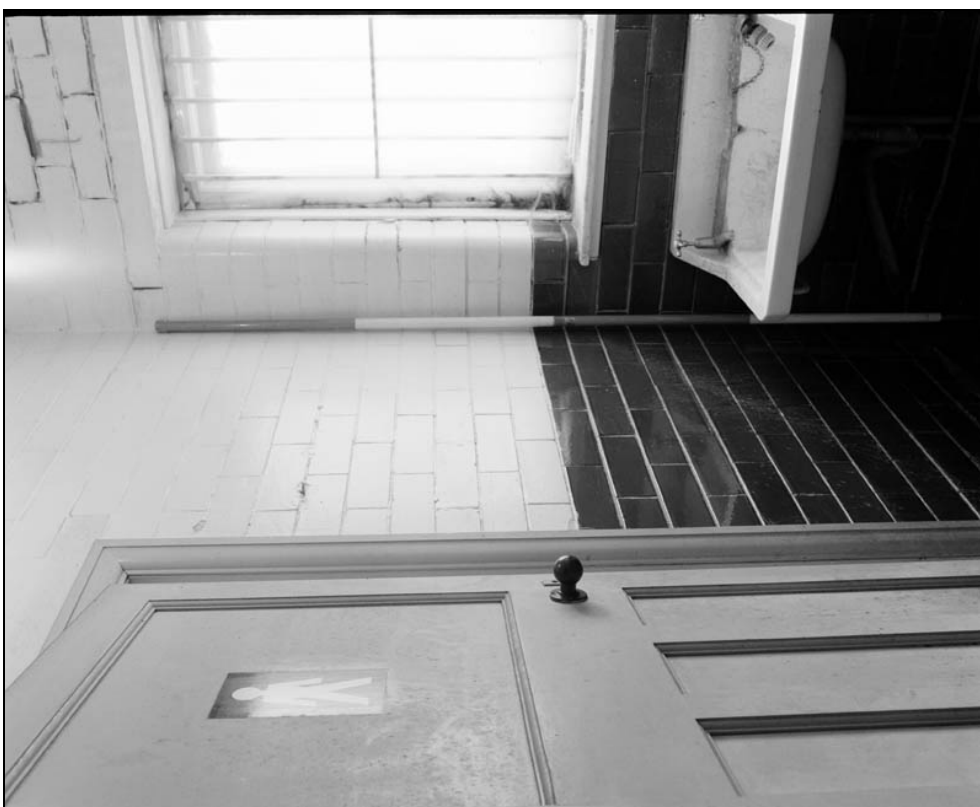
General view of G8 in building 4, note c1930s paneled door (film 21:7)
